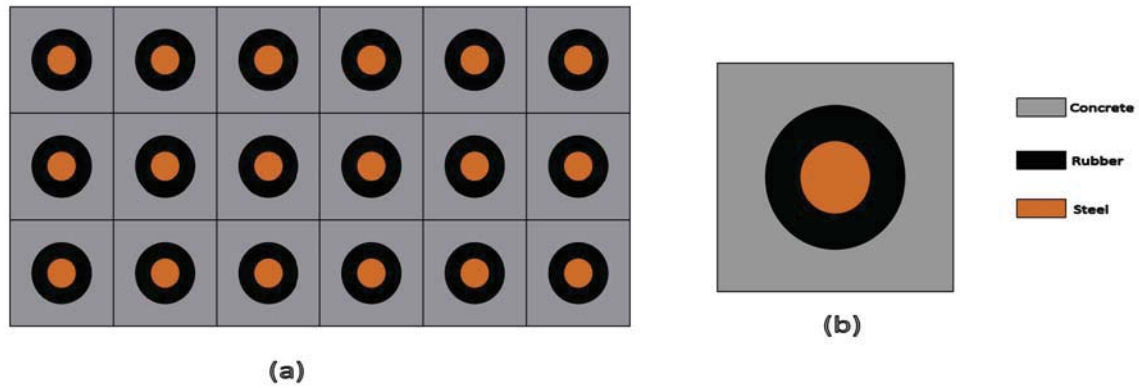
(a) plan (xy) section of periodic foundation, (b) plan (xy) section of the unit cell
